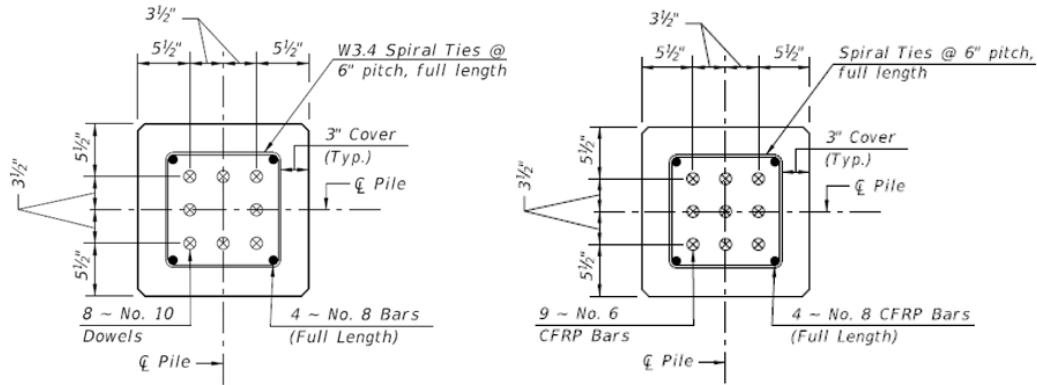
The pile cross section for steel bars (left) and CFRP bars (right) [48]
